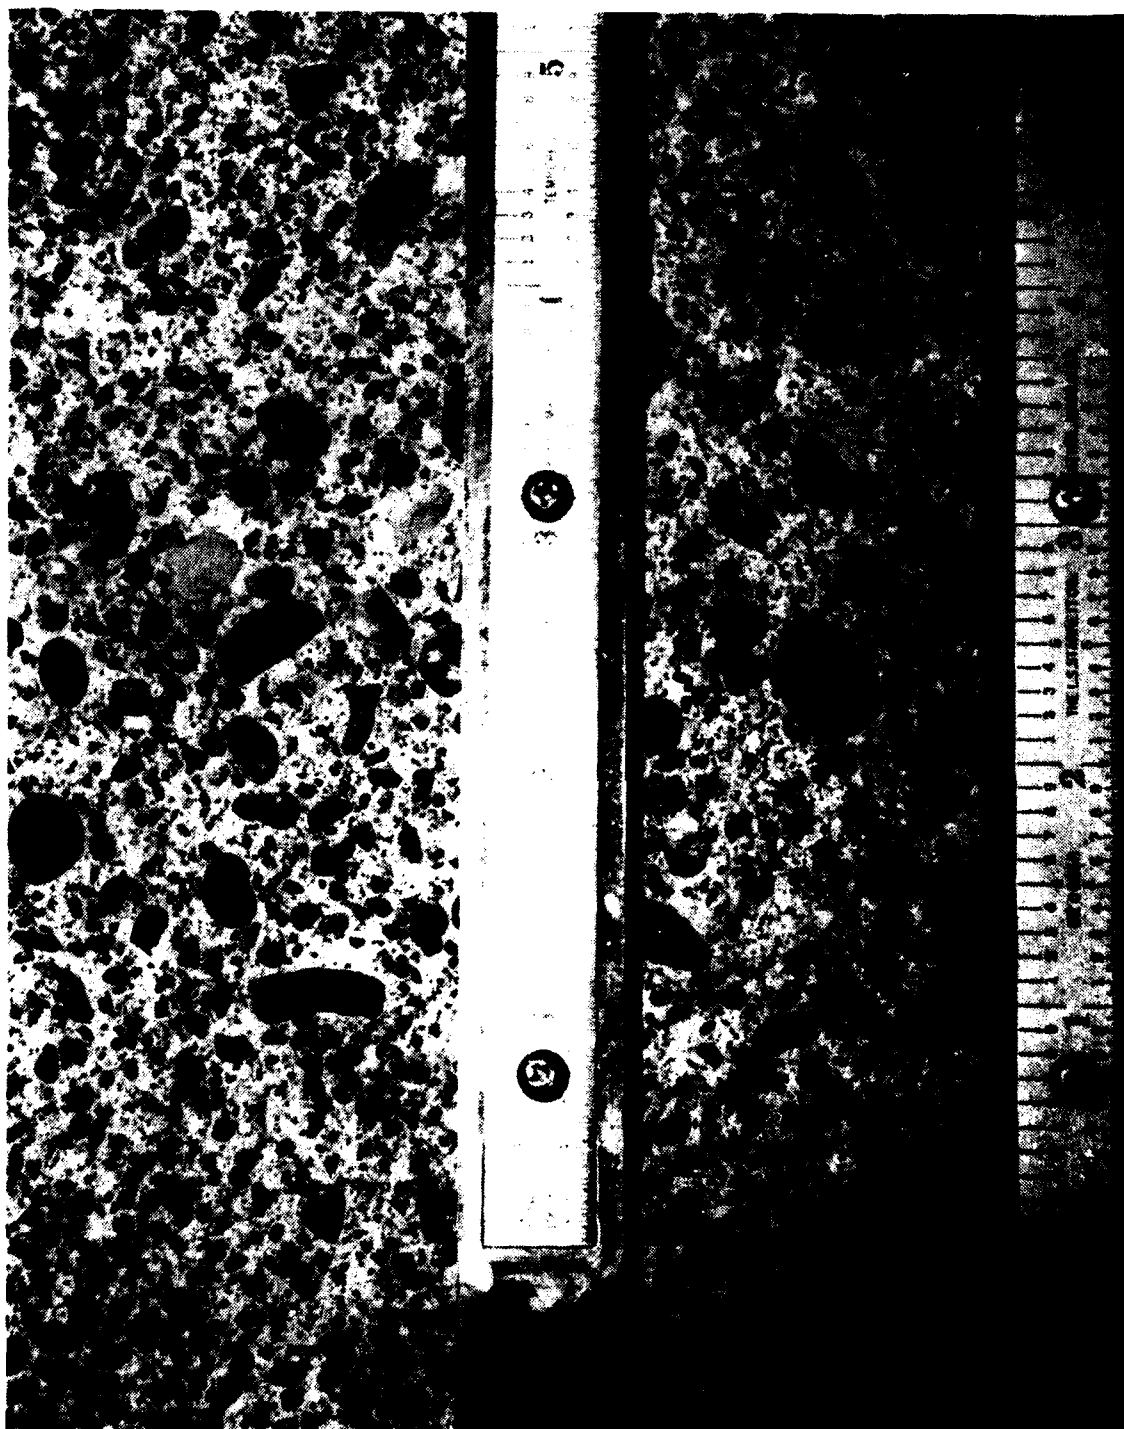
RUNWAY D, A WORN PORTLAND CEMENT CONCRETE (RUNWAY A SIMILAR)
